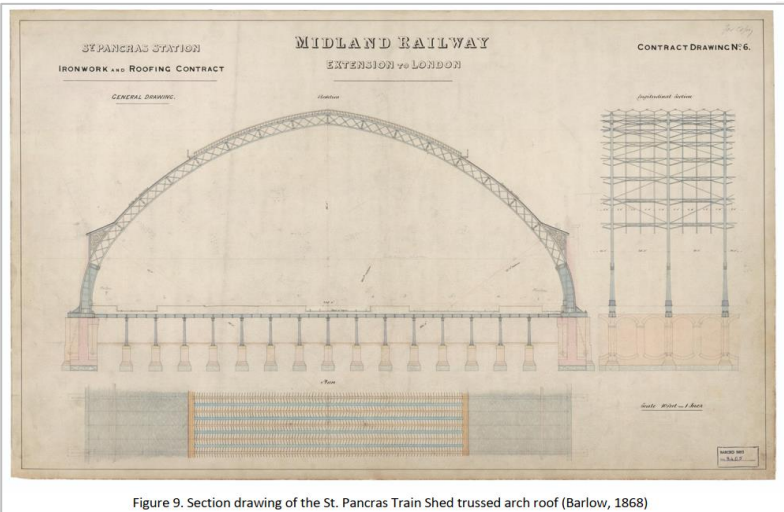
Section drawing of the St. Pancras Train Shed trussed arch roof (Barlow, 1868)
